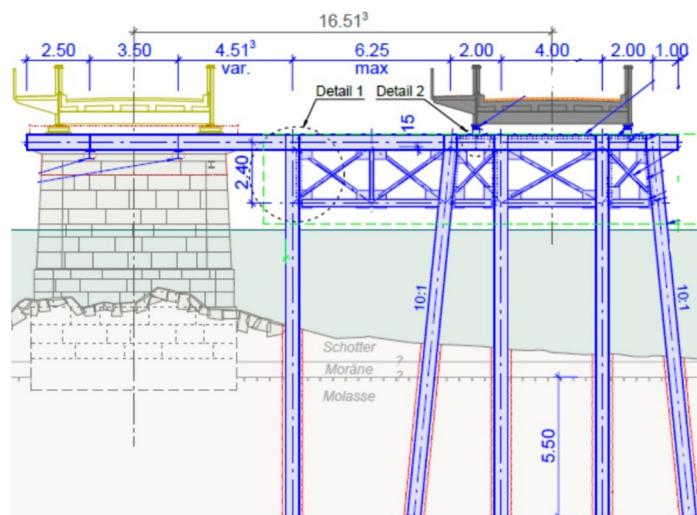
Cross section through bridge. Left side: Stone masonry pillar with the bridge in its original position.
